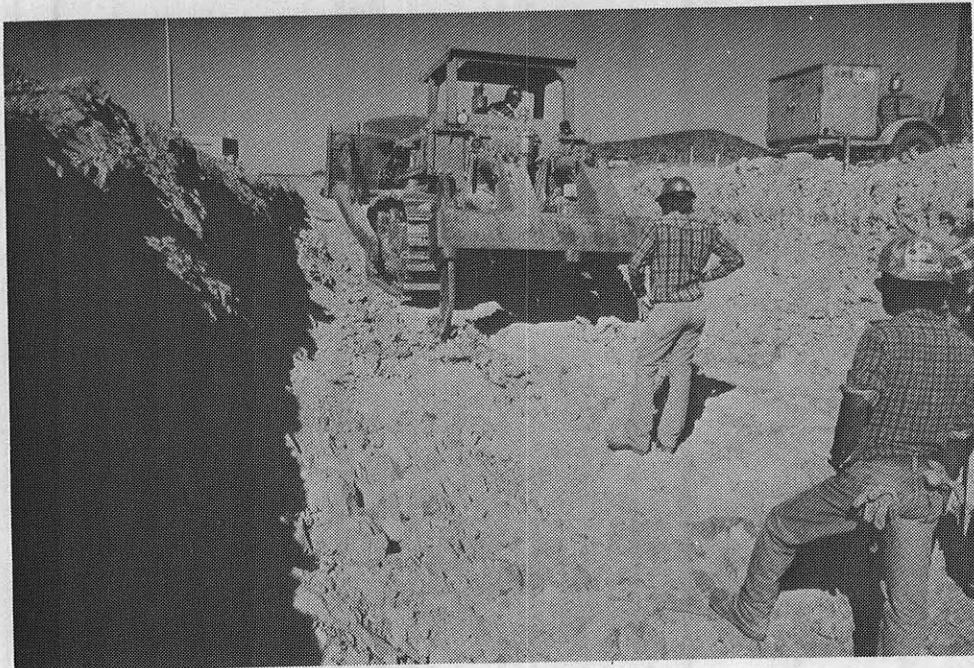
Dozer ripping high spot at station 19+70 in outlet conduit trench. January 1984
